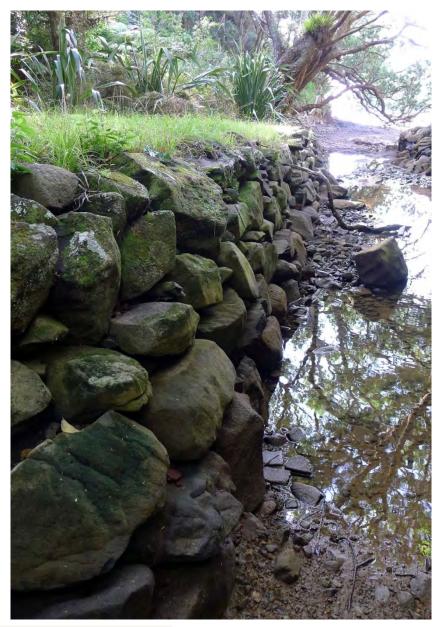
Western retaining wall at the bake house site. (Auckland Council March 2018).
